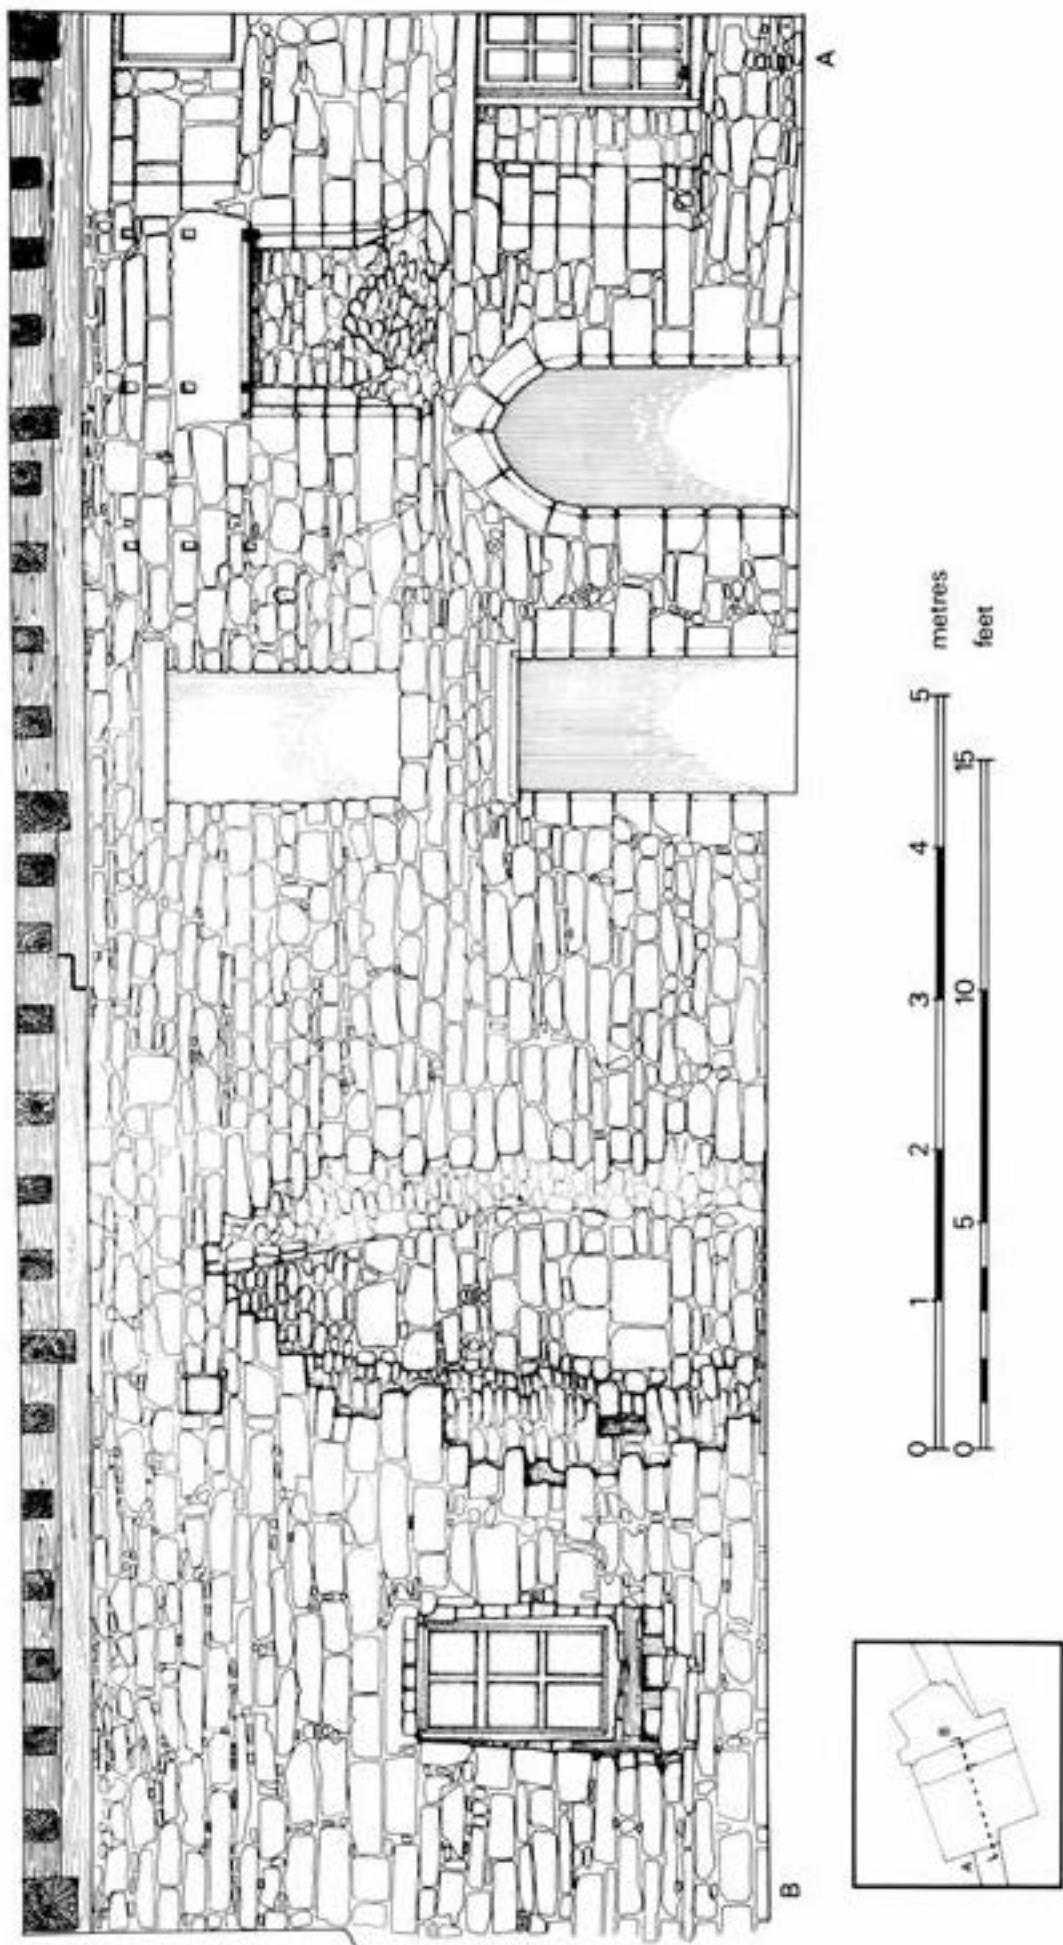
The outer gatehouse; internal east-west elevation of the south wall of the hall and the service area (room 10)
